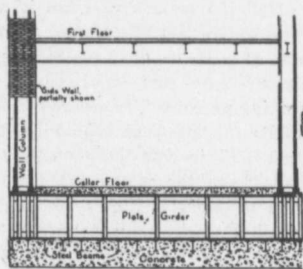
The steel grillage foundation, designed for a high office building resting on quick sand.
